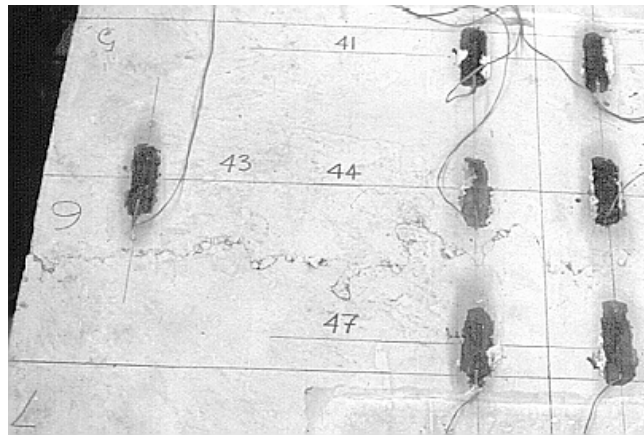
Typical Flexural Failure Resulting in Spalling of the Concrete Deck
